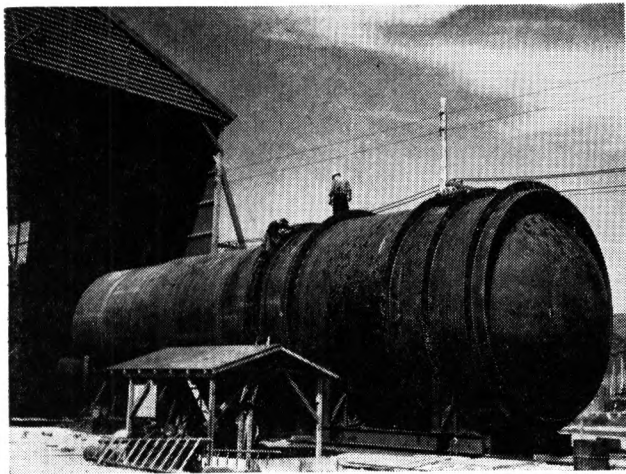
TESTING MACHINE FOR MAIN-UNIT PENSTOCKS
